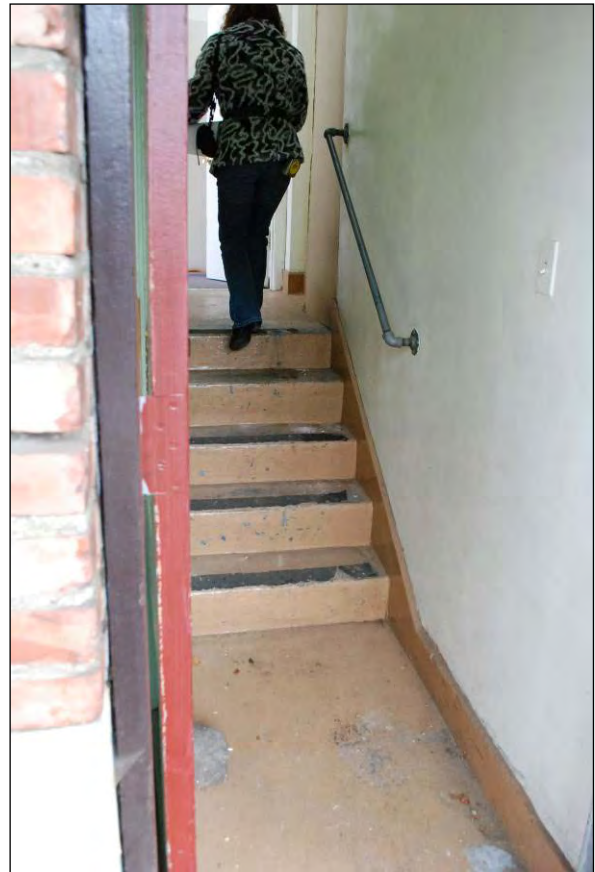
Right: View of entry vestibule to western half of second floor (April 2011)
